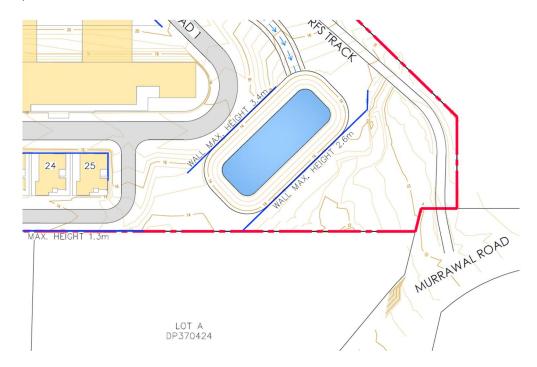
extract of engineering plans showing location of detention basin within the site and the height of associated retaining walls in proximity to the neighbour.
